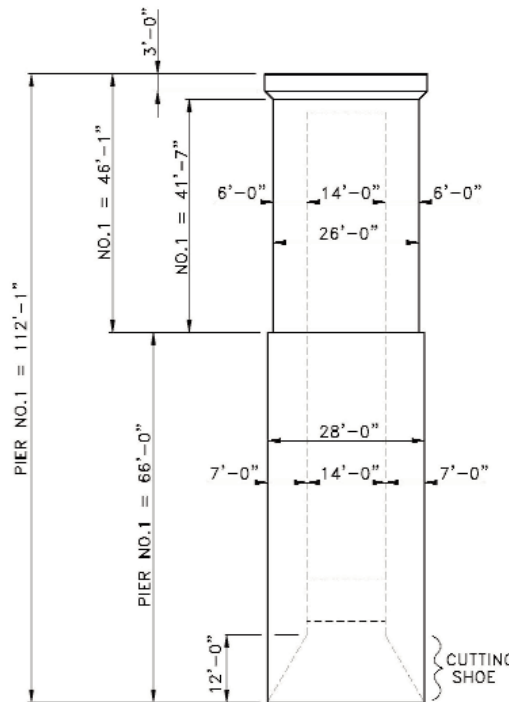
Chef Menteur Bridge Pier No. 1 Details
